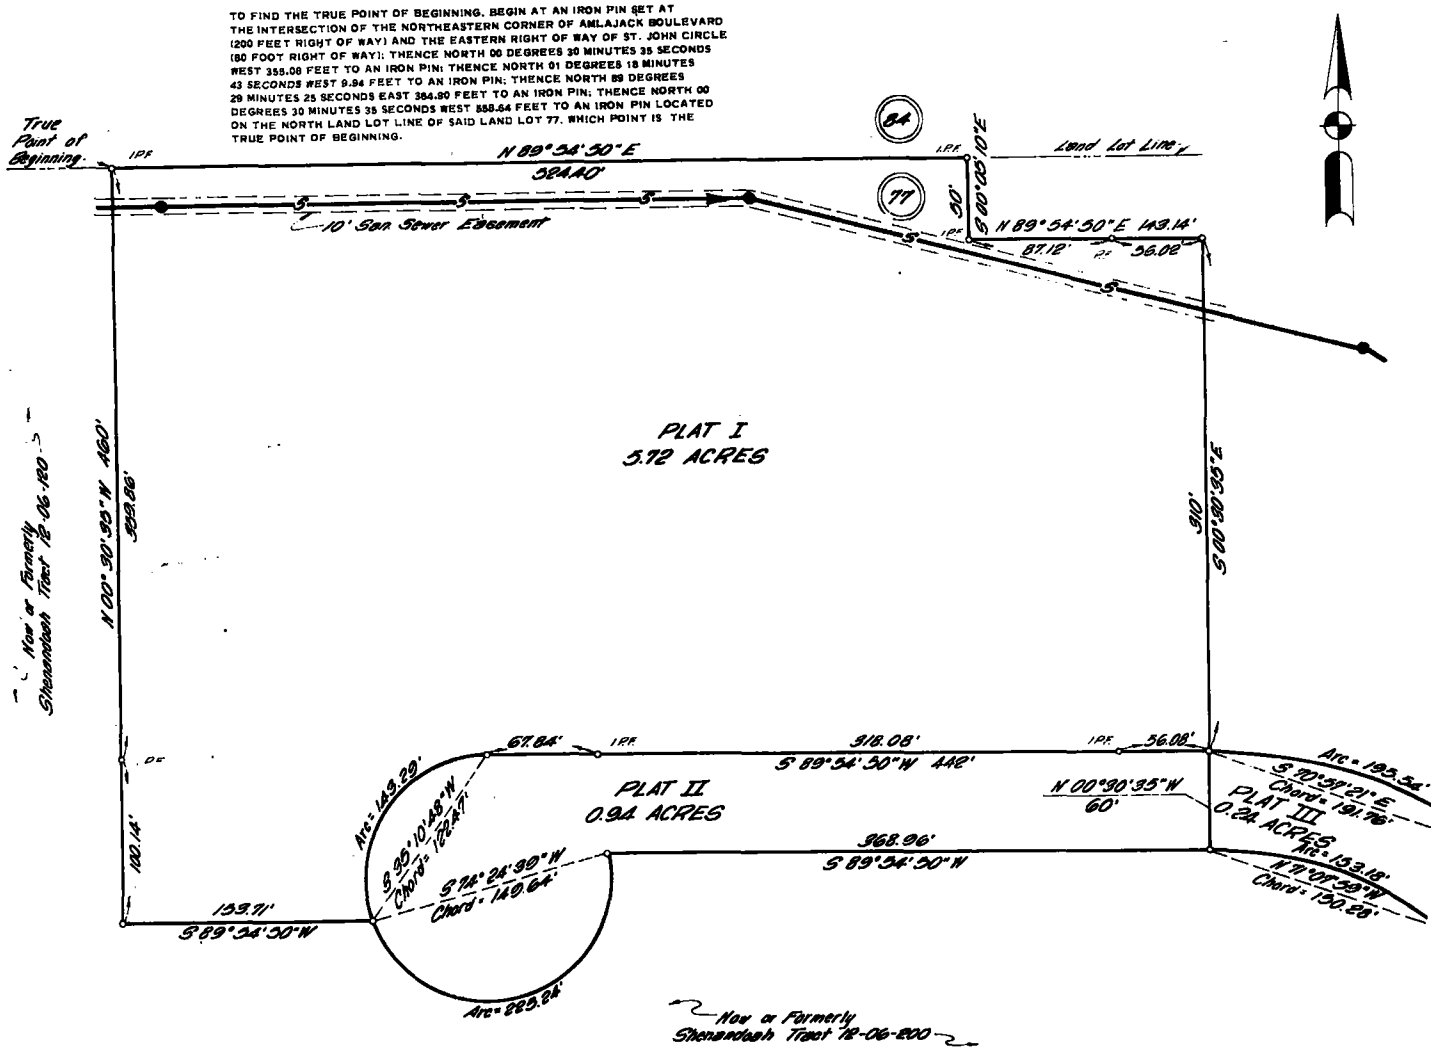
The Plot Plan (5.72 Acre Plot)
